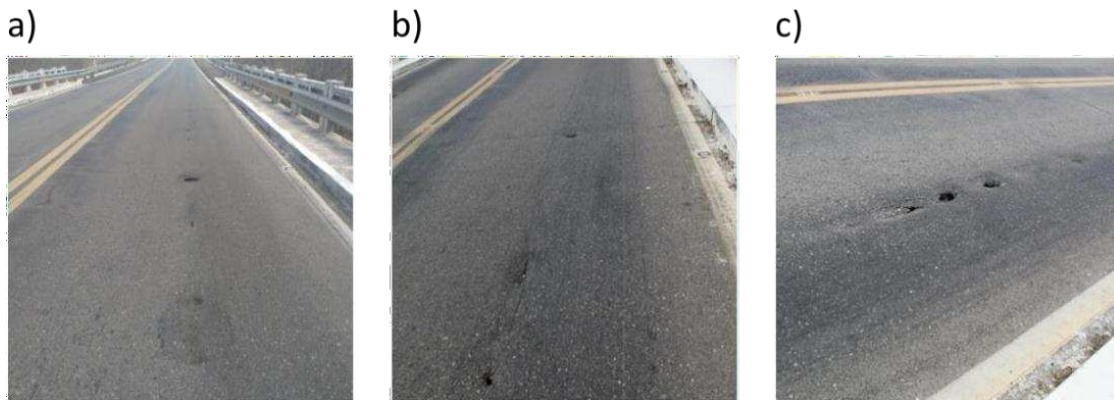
Recurring bridge damage 03 in bridge; a) Damage at 2020 inspection; b) and c) Damage at 2023 inspection
